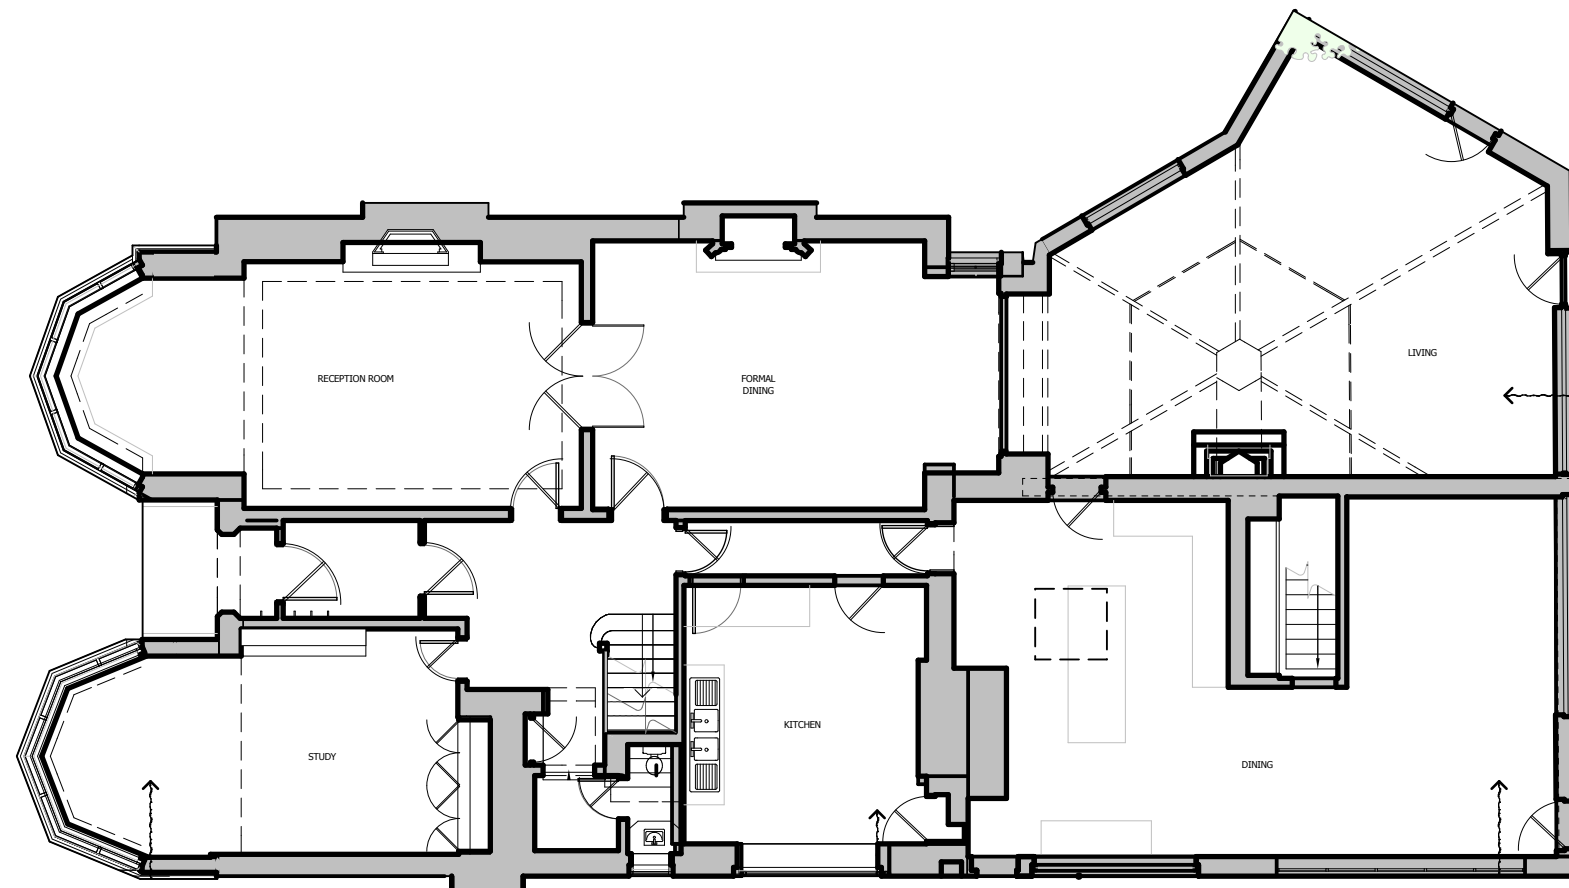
Existing plan of Ground Floor (NTS)
